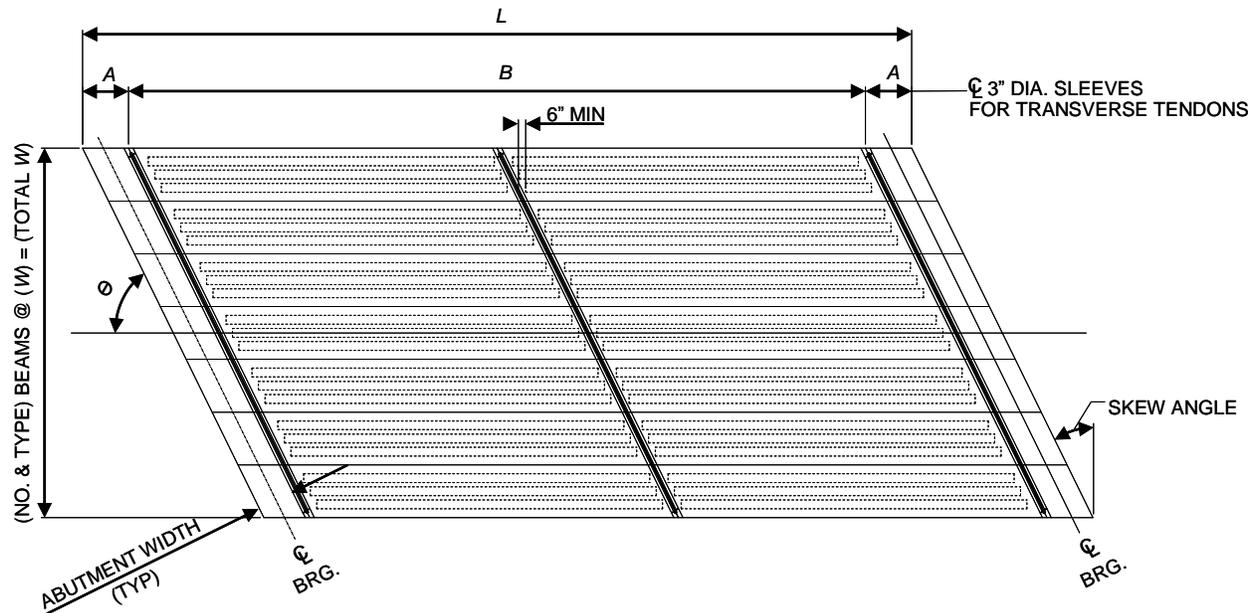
1 Framing plan for prestressed voided slab units
